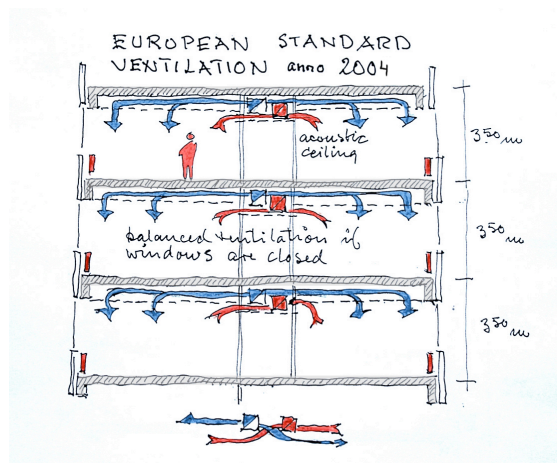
Standard installation – cross section lowered ceilings = 0.6 m
